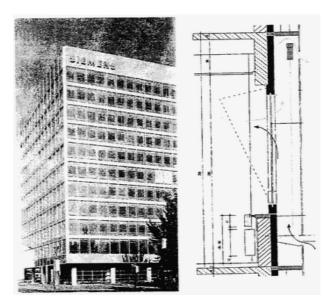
Natural ventilation of tall buildings with double façades (Siemens building, Dortmund) /2/
